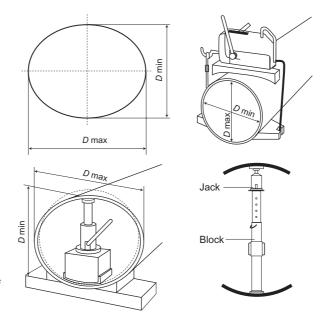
Correction of pipe deformation (Pont-a-Mousson, 1992).
